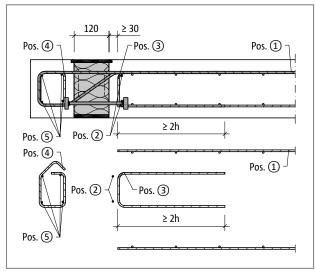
Schöck Isokorb® XT type O: On-site reinforcement
